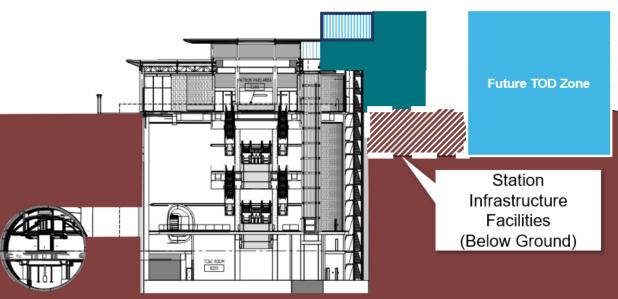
Diridon BART Station – Draft Sketch (Site Plan and Cross Section) of Station Infrastructure
